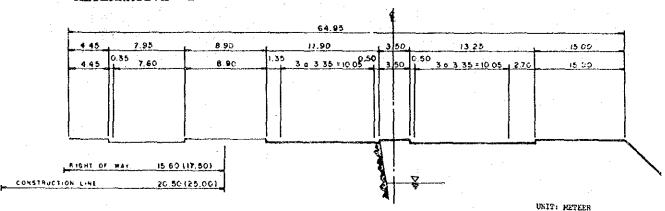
TYPICAL CROSS SECTION OF CORREDOR SUR (MARANON-RIO MATAZNILLO)
